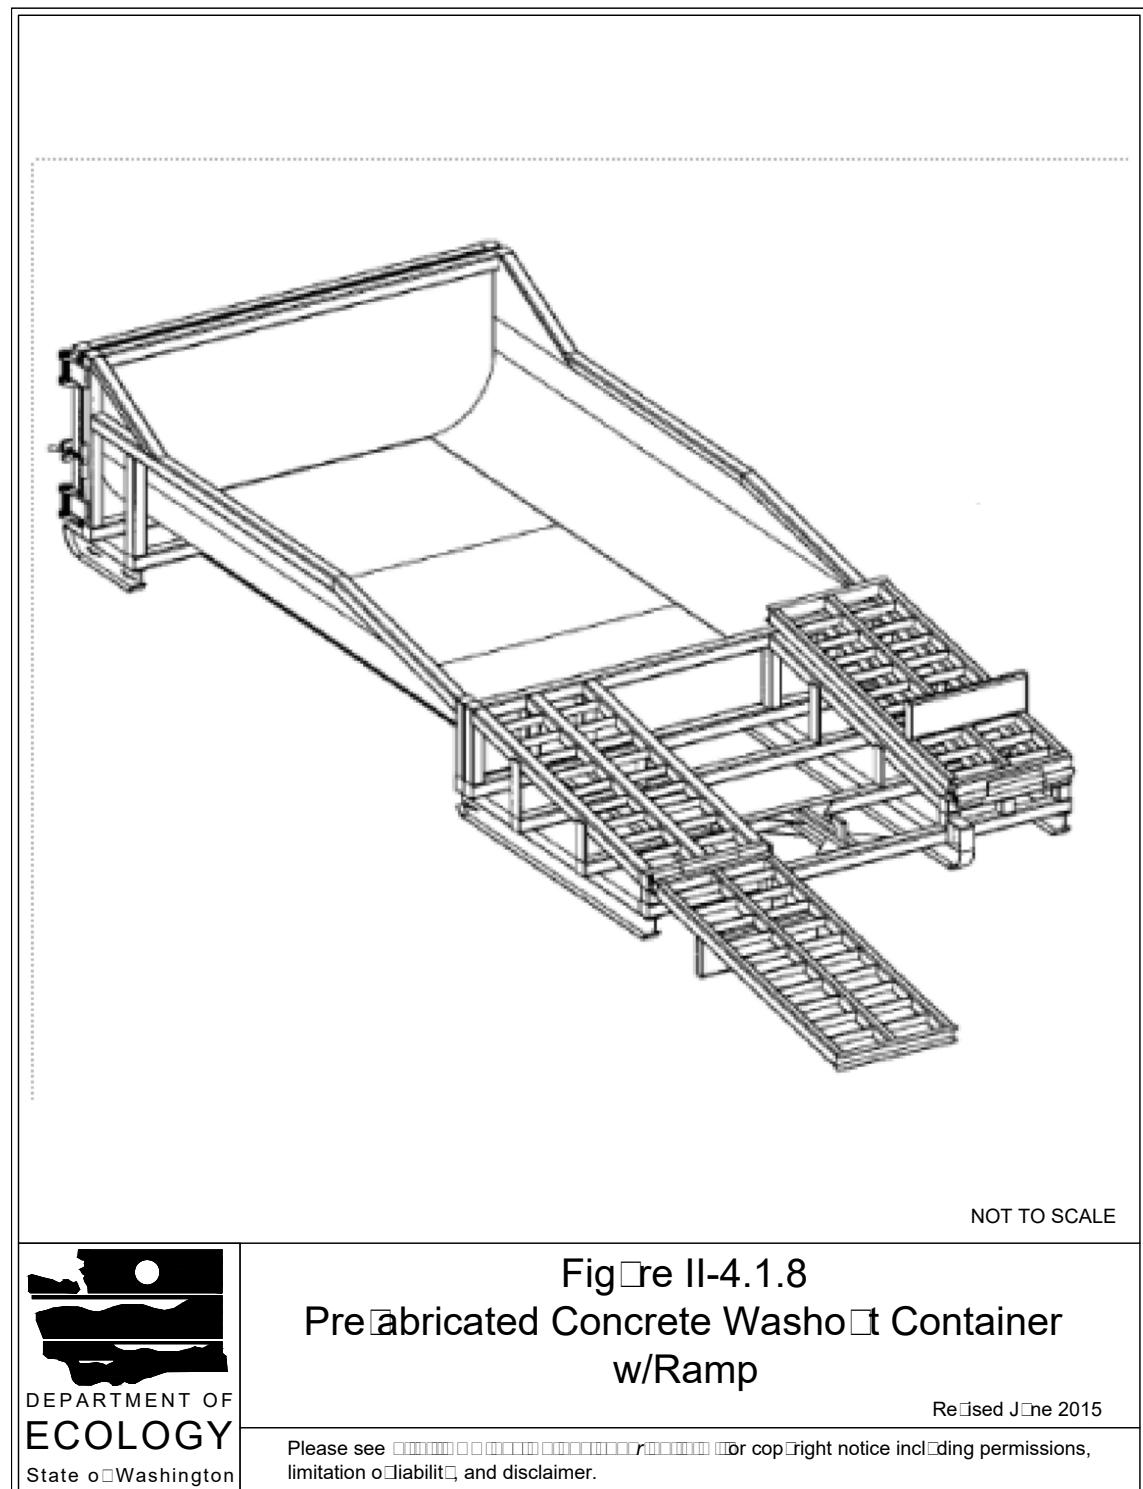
Prefabricated Concrete Washout Container w/Ramp
